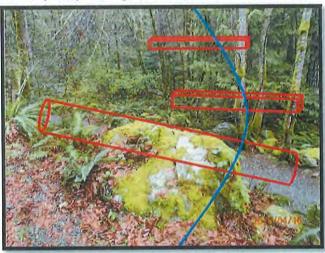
West ped pipe, footing and roadway. View is from east side of creek south (upstream) of structure.
